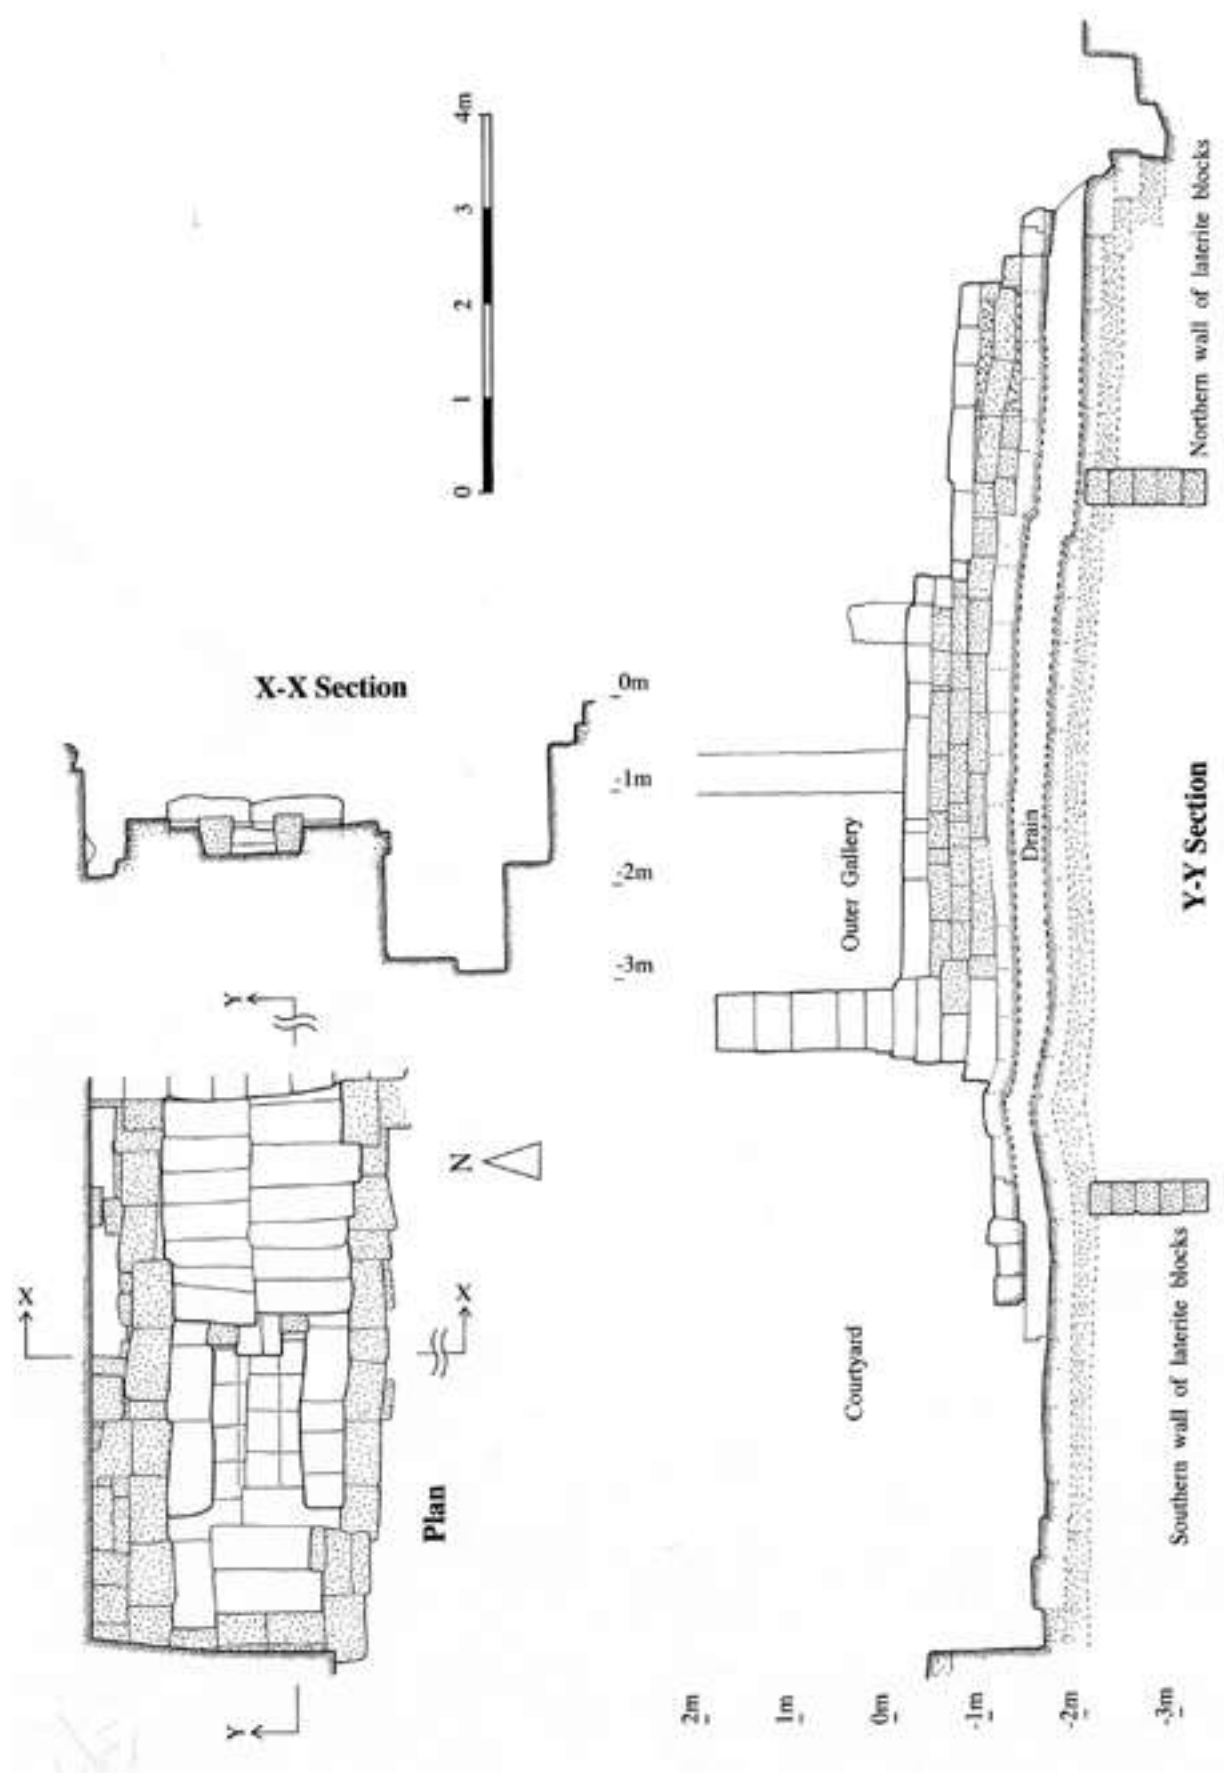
Plan and cross section of the "Culvert" and "Laterite Walls." / 暗渠とラテライト壁体の平面図及び断面図 .
